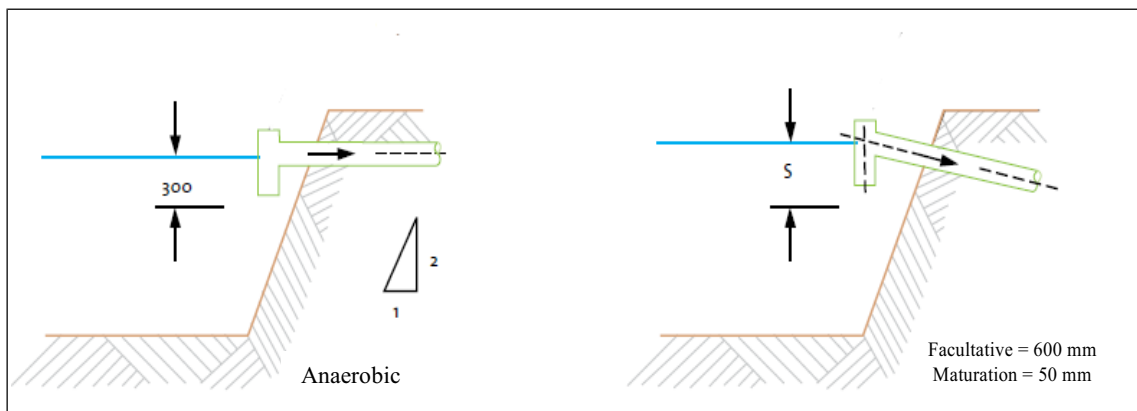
Pipe outlet designs (Source: Waste Stabilisation Pond Design Manual – Power and Water Corporation)
